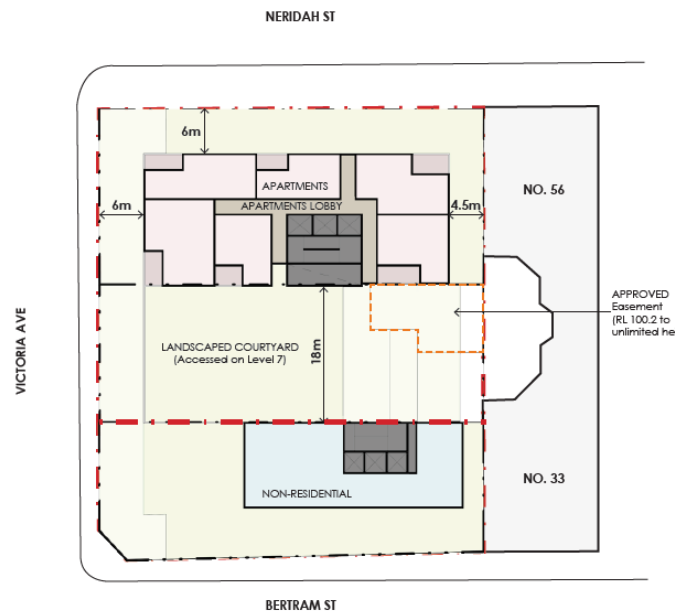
Proposed concept plan of level 7 – (podium level) (source: APlus Design Group)
